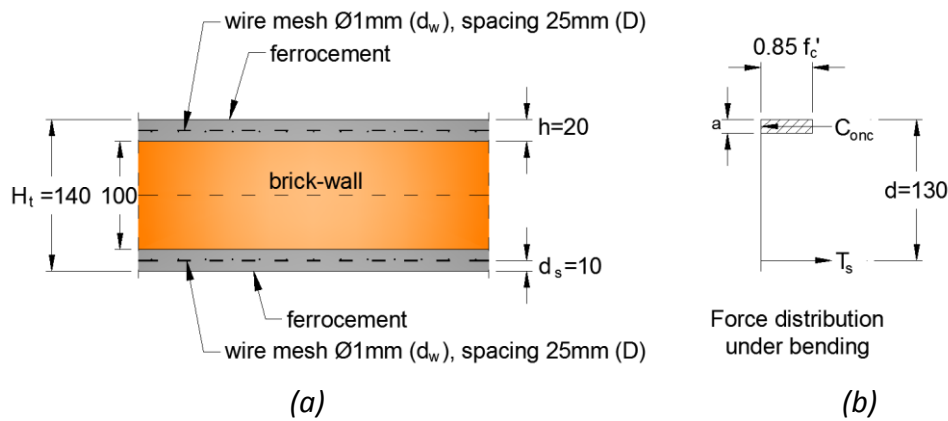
(a) Section of Half-Brick-Thick Wall Panel Strengthened using Wire Mesh;
